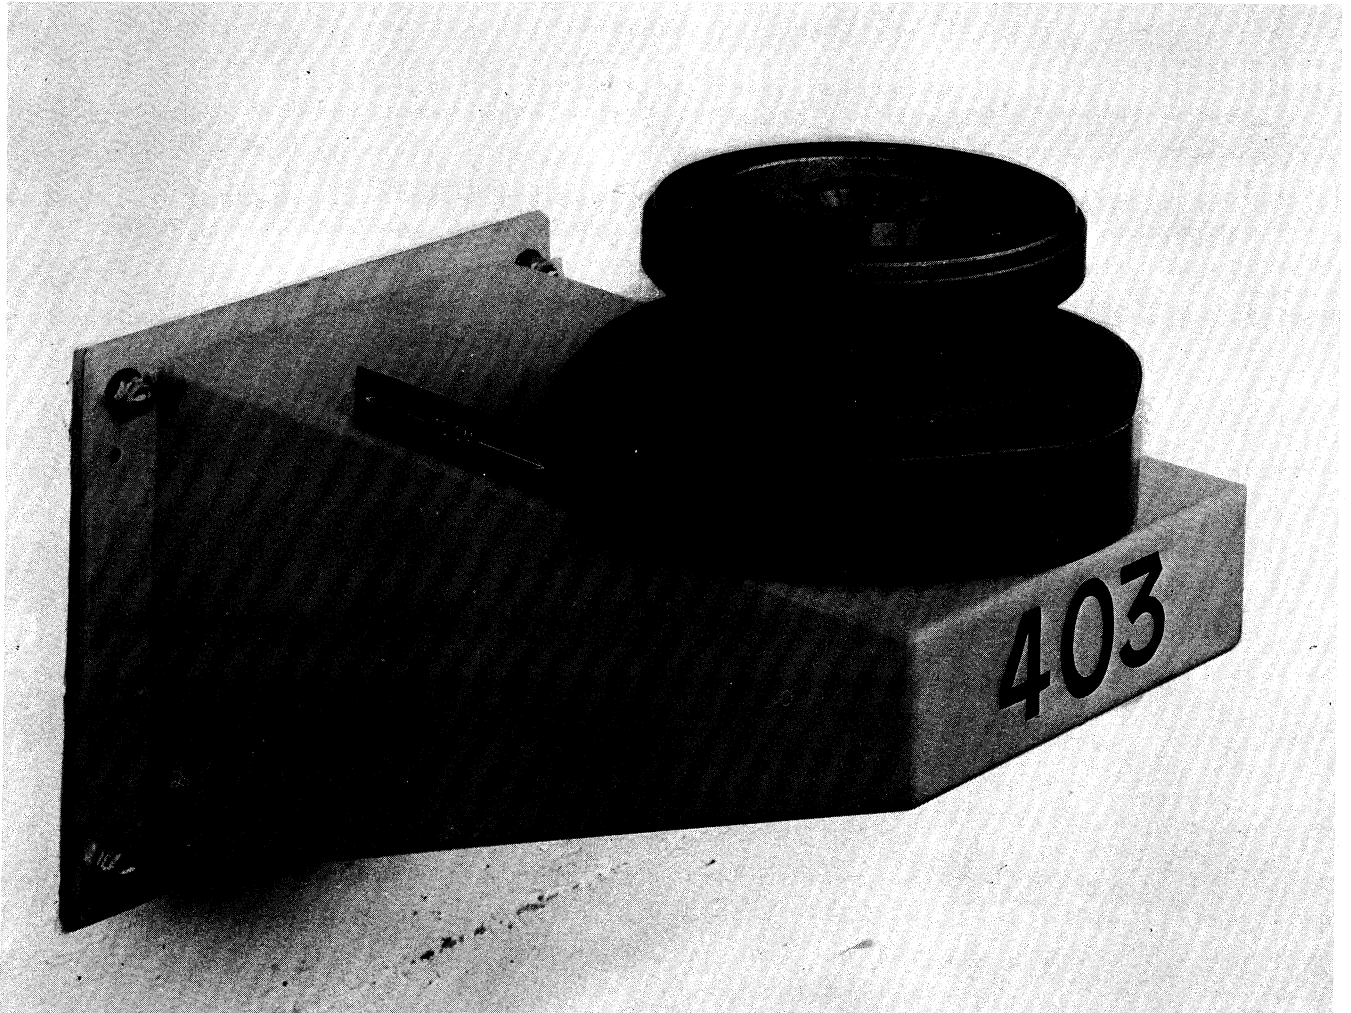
Bracket or Cantilever fixed to the tunnel wall with adjustable socket carrying the precision hole
